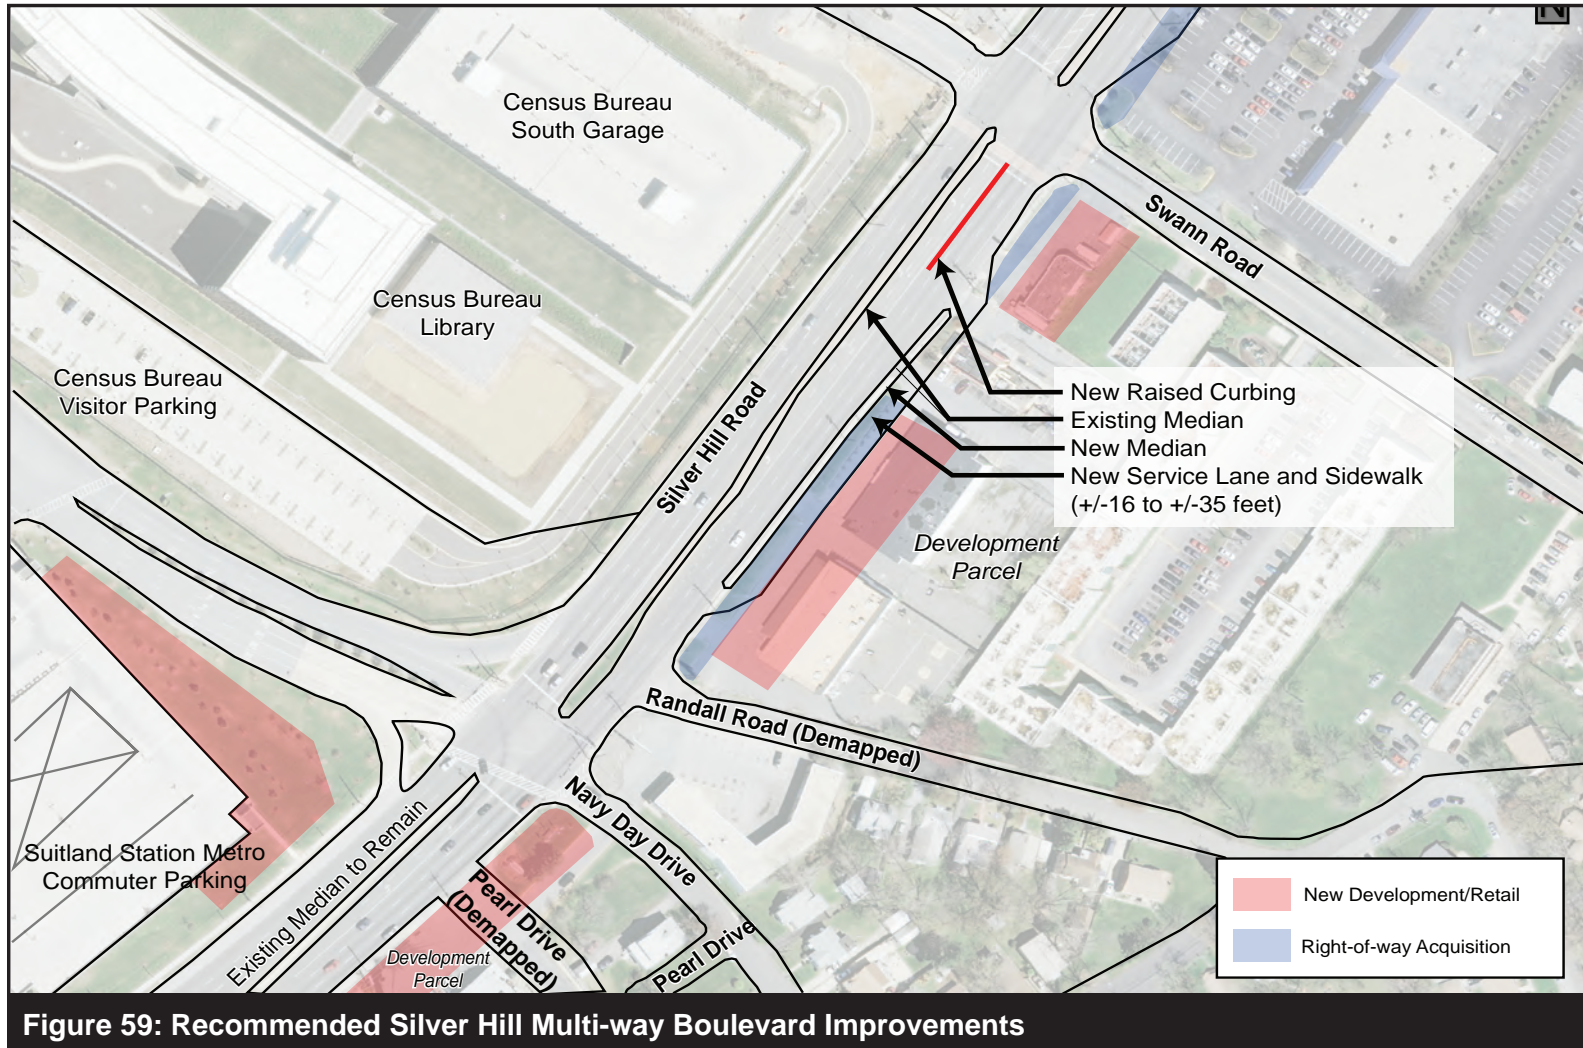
Recommended Silver Hill Multi-way Boulevard Improvements
